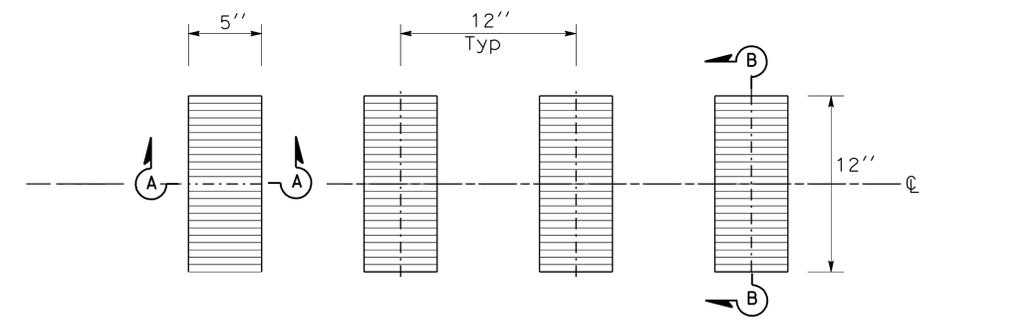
WITH CENTERLINE RUMBLE STRIP
